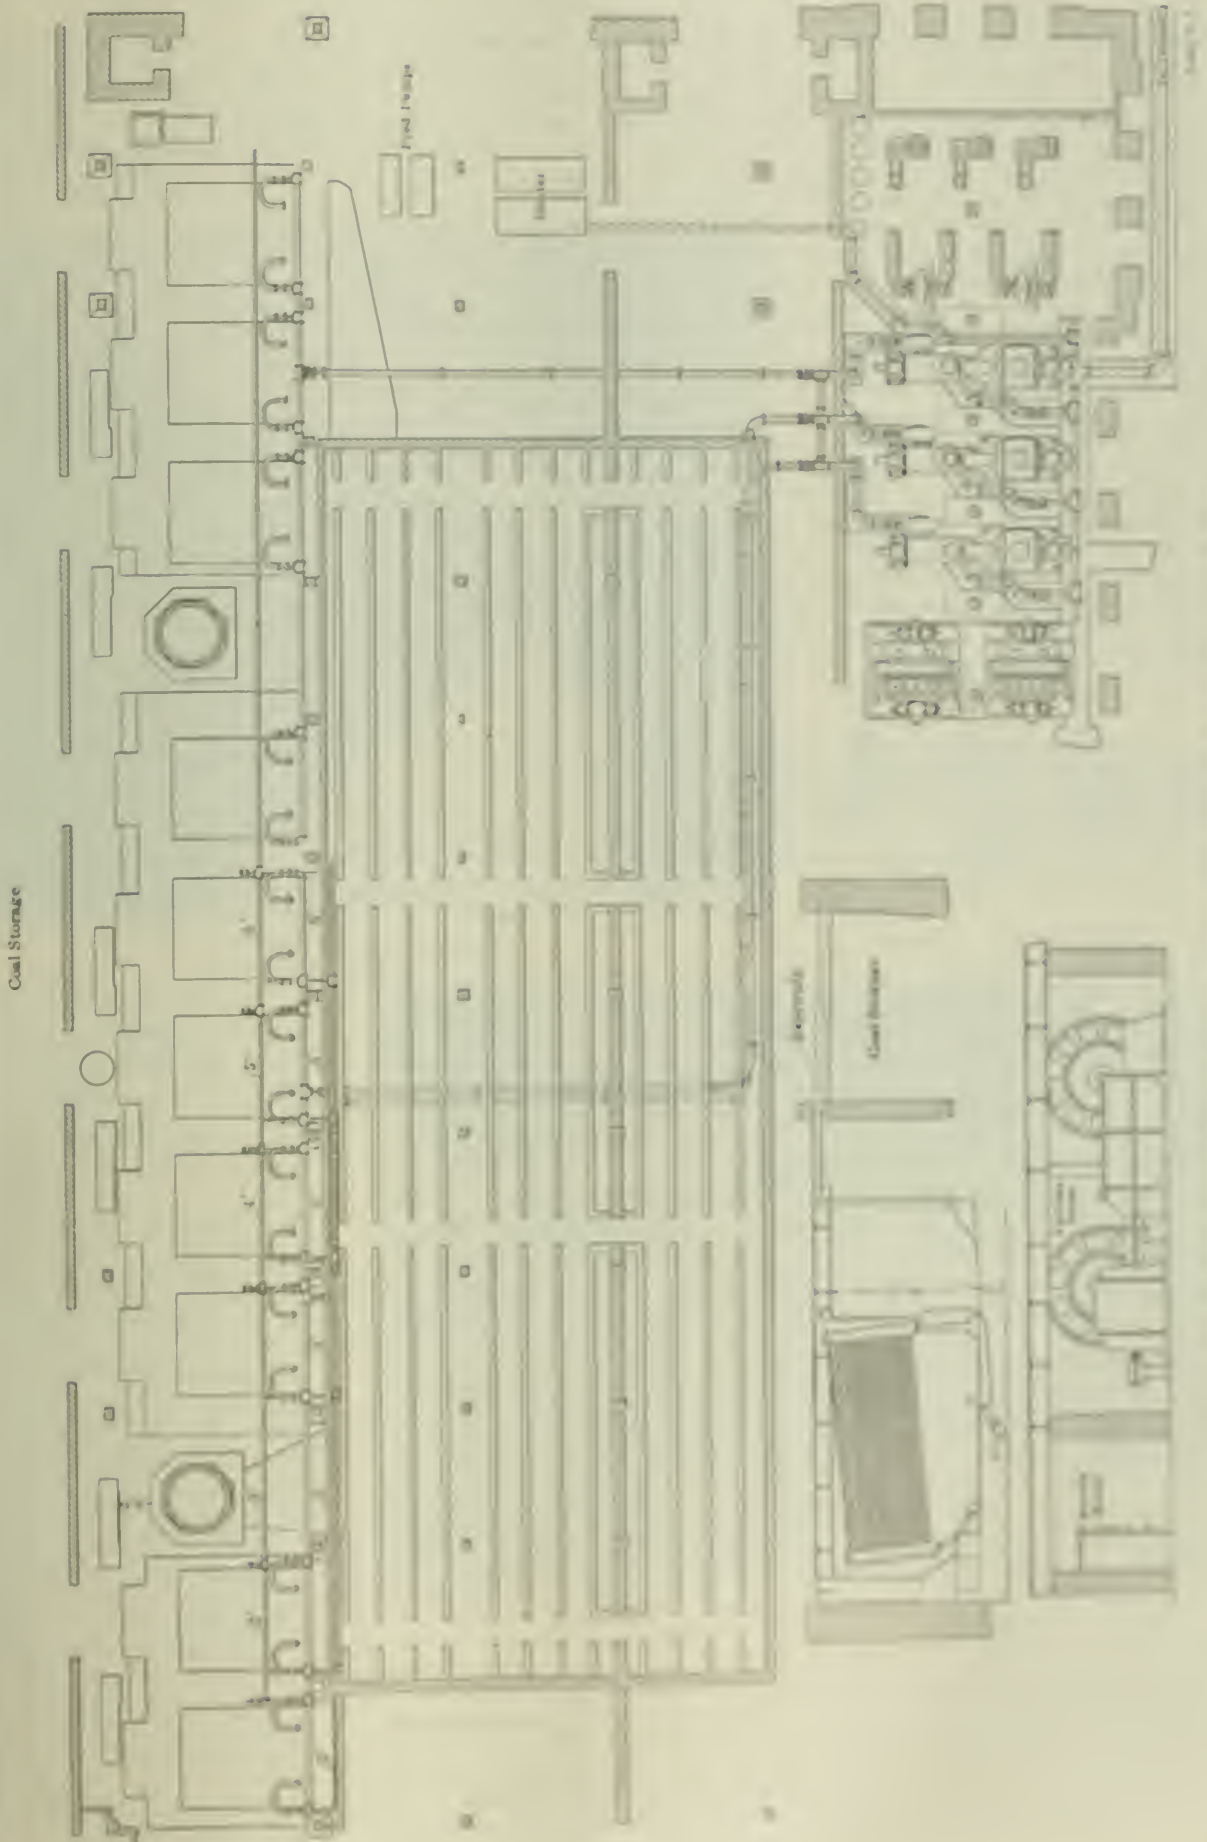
PLAN OF BOILER PLANT AND ELECTRICAL EQUIPMENT OF HOUSE AND COALBURN ROOM.
